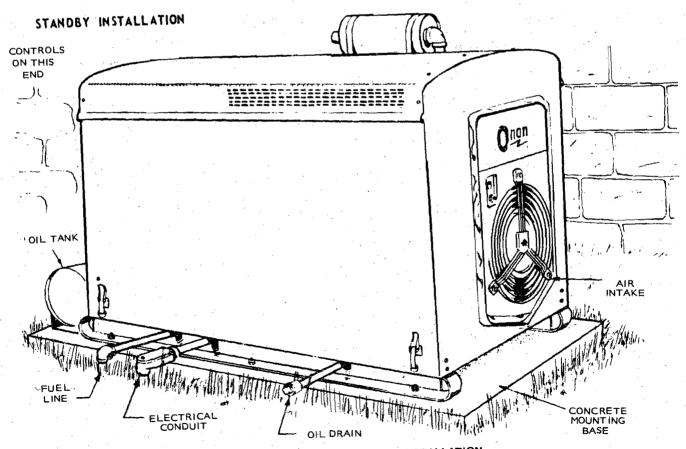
TYPICAL OUTDOOR INSTALLATION
